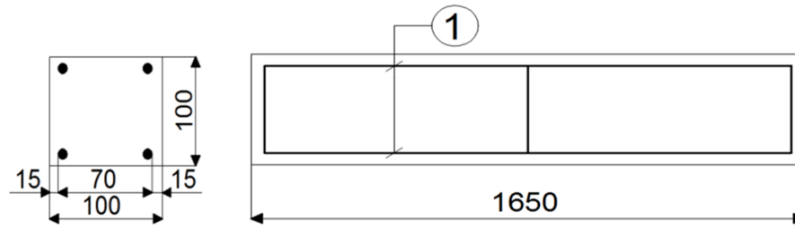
Scheme of reinforcement of fibreconcrete beams:
